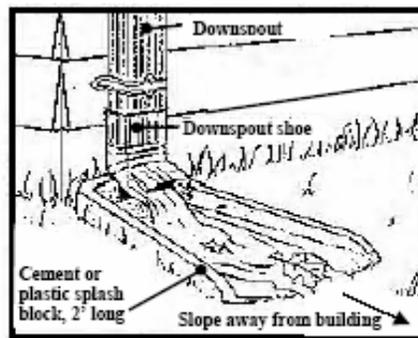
Correct installation of downspout shoe and splash block at foundation wall.
